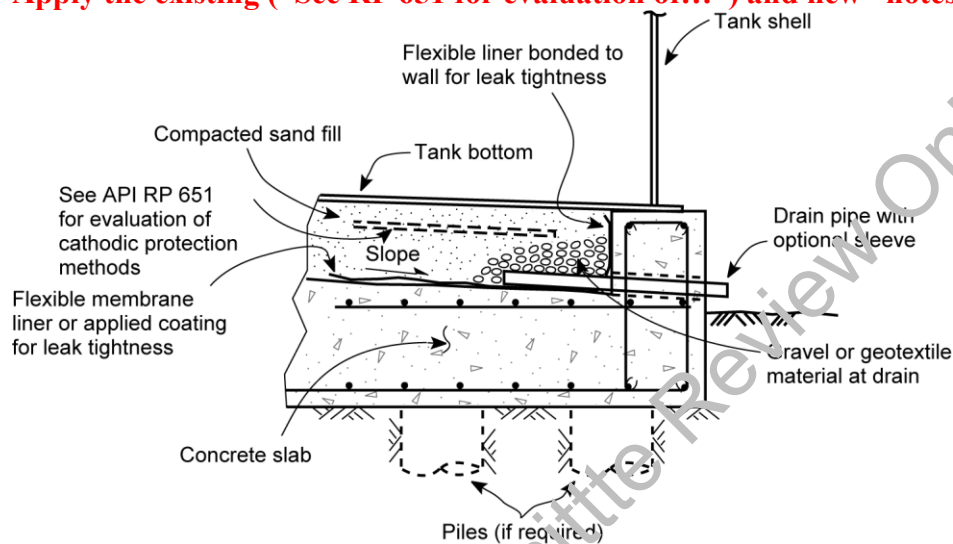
Reinforced Concrete Slab with Leak Detection at the Perimeter (Typical Arrangement)
